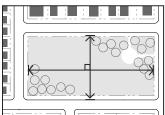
Examples of Measuring the Minimum Dimension of Open Space Types.
